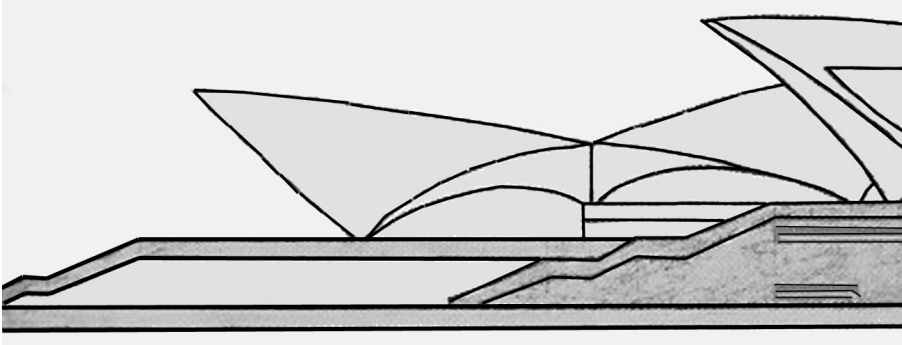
The supporting concrete beams span 47.5 metres (156 feet) across and down the slope of the grand stairs, without columns. The top surfaces of the structural beams are covered by precast granite paving, which incorporates open joints to let surface water run off into troughs formed between the beams. 'Submission no. 218', SOH Competition Drawings (Dec. 1956). Technical Information Management Services, Record No. D1419. (Courtesy of Sydney Opera House Trust)
